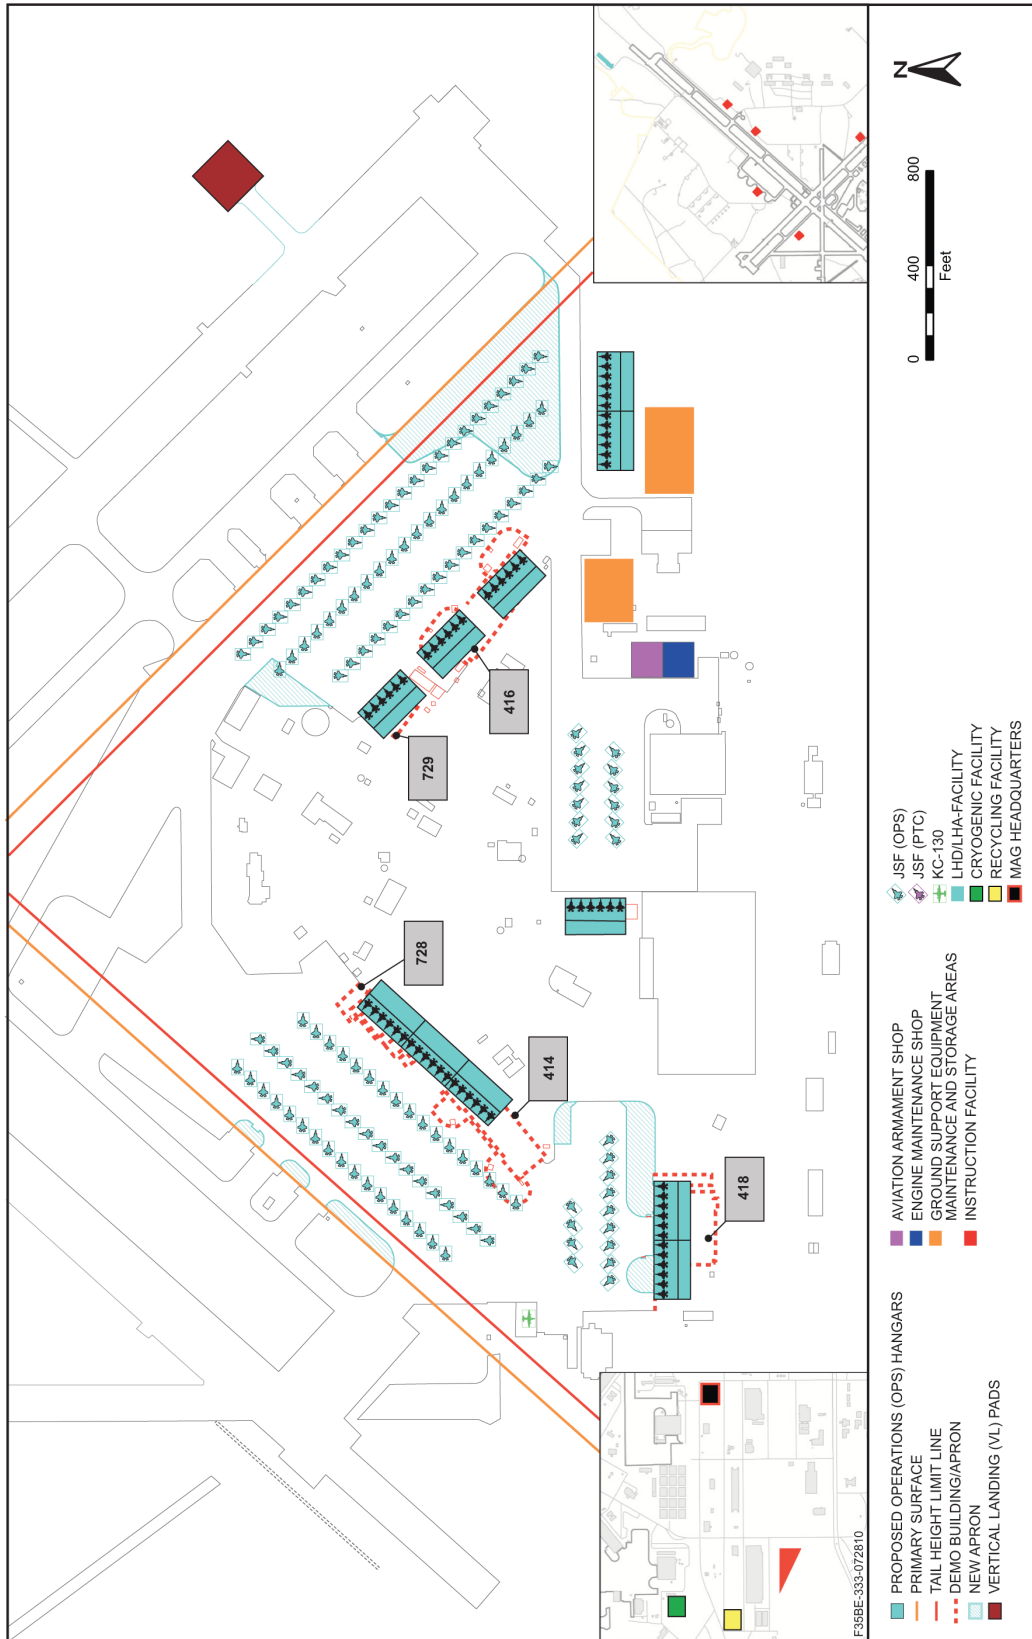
Alternative 2 Proposed Aircraft Flightline and Support Facility Construction at MCAS Beaufort
